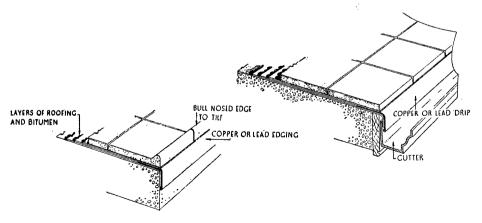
Section at verge Fig. 22.—Section at eaves (D. Anderson & Son Ltd.)
